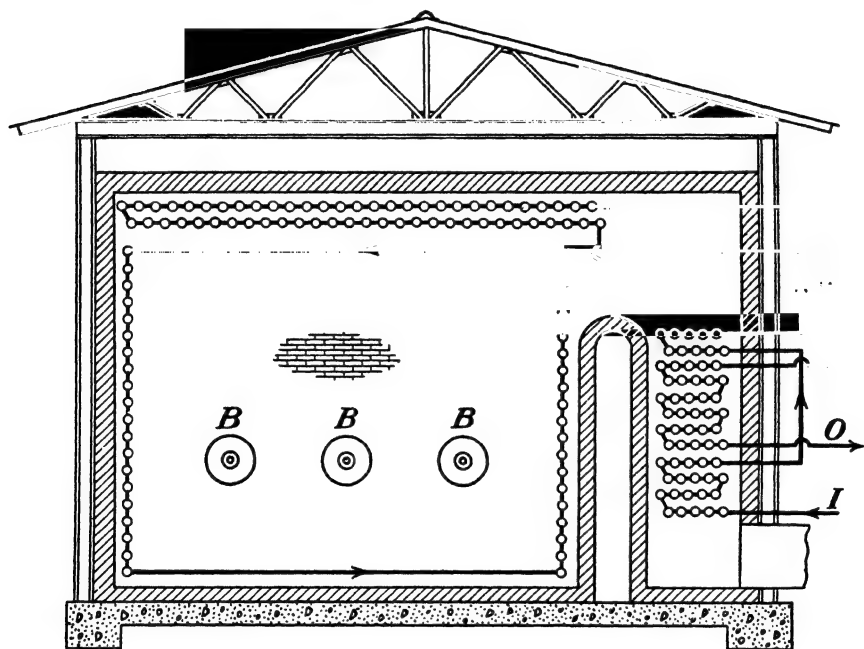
Cracking furnace with soaking banks. (Courtesy of Universal Oil Products Company.)
